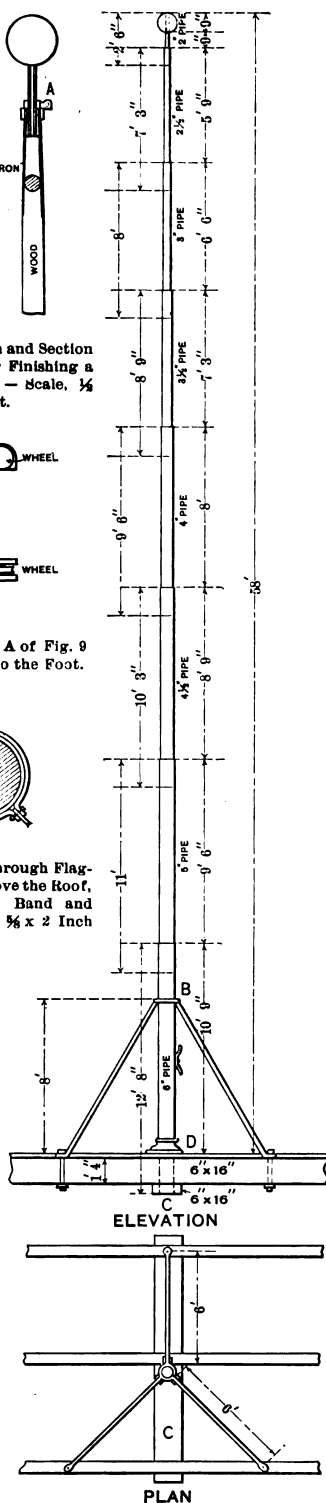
Plan and Elevation of an Iron Flagstaff for a High Building.—Scale, $\frac{1}{4}$ Inch to the Foot.
